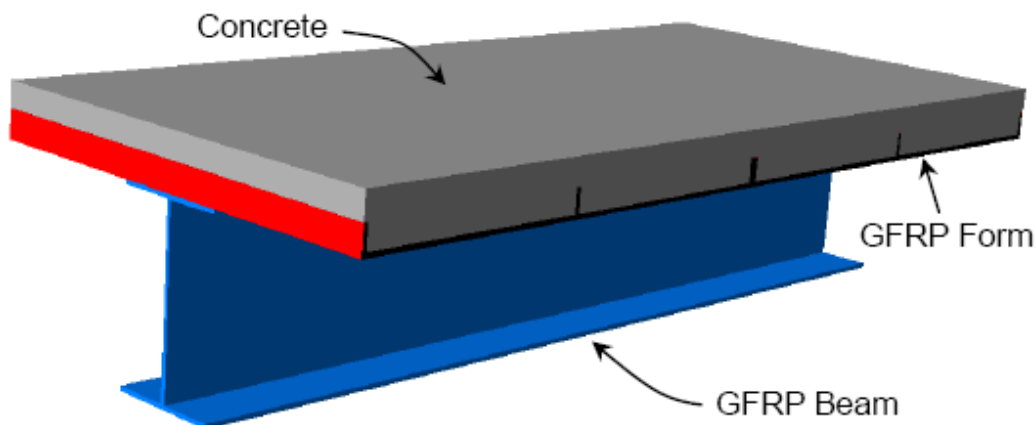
Steel-free composite slab-on-girder design (Li et al., 2006)
